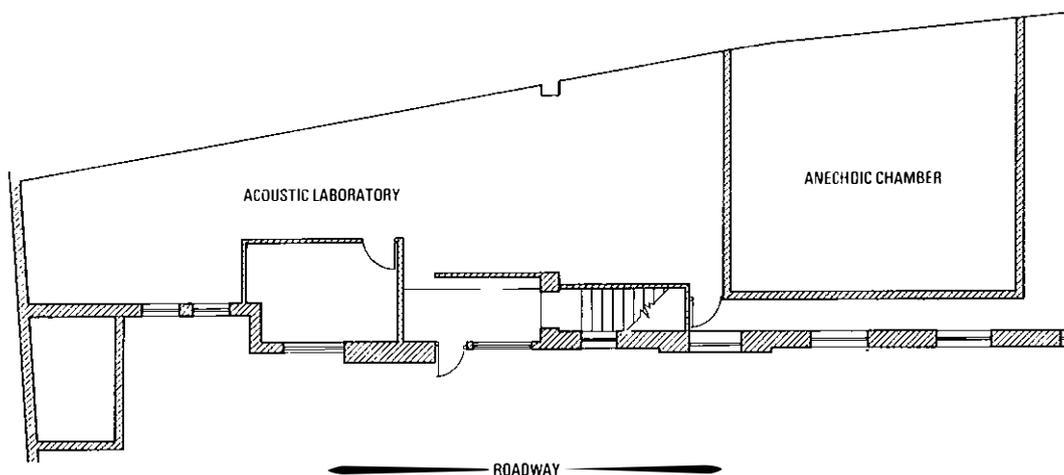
Outline plan of anechoic chamber and acoustic laboratory
